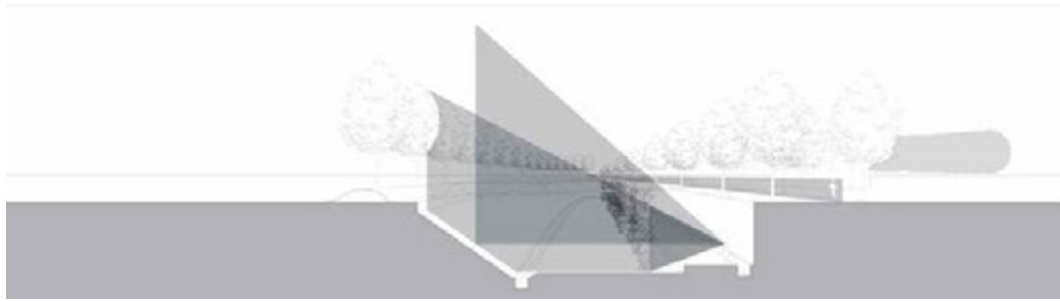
Sectional Elevation Jardin des Bambous. (Drawing: Tim Peeters & Author).
